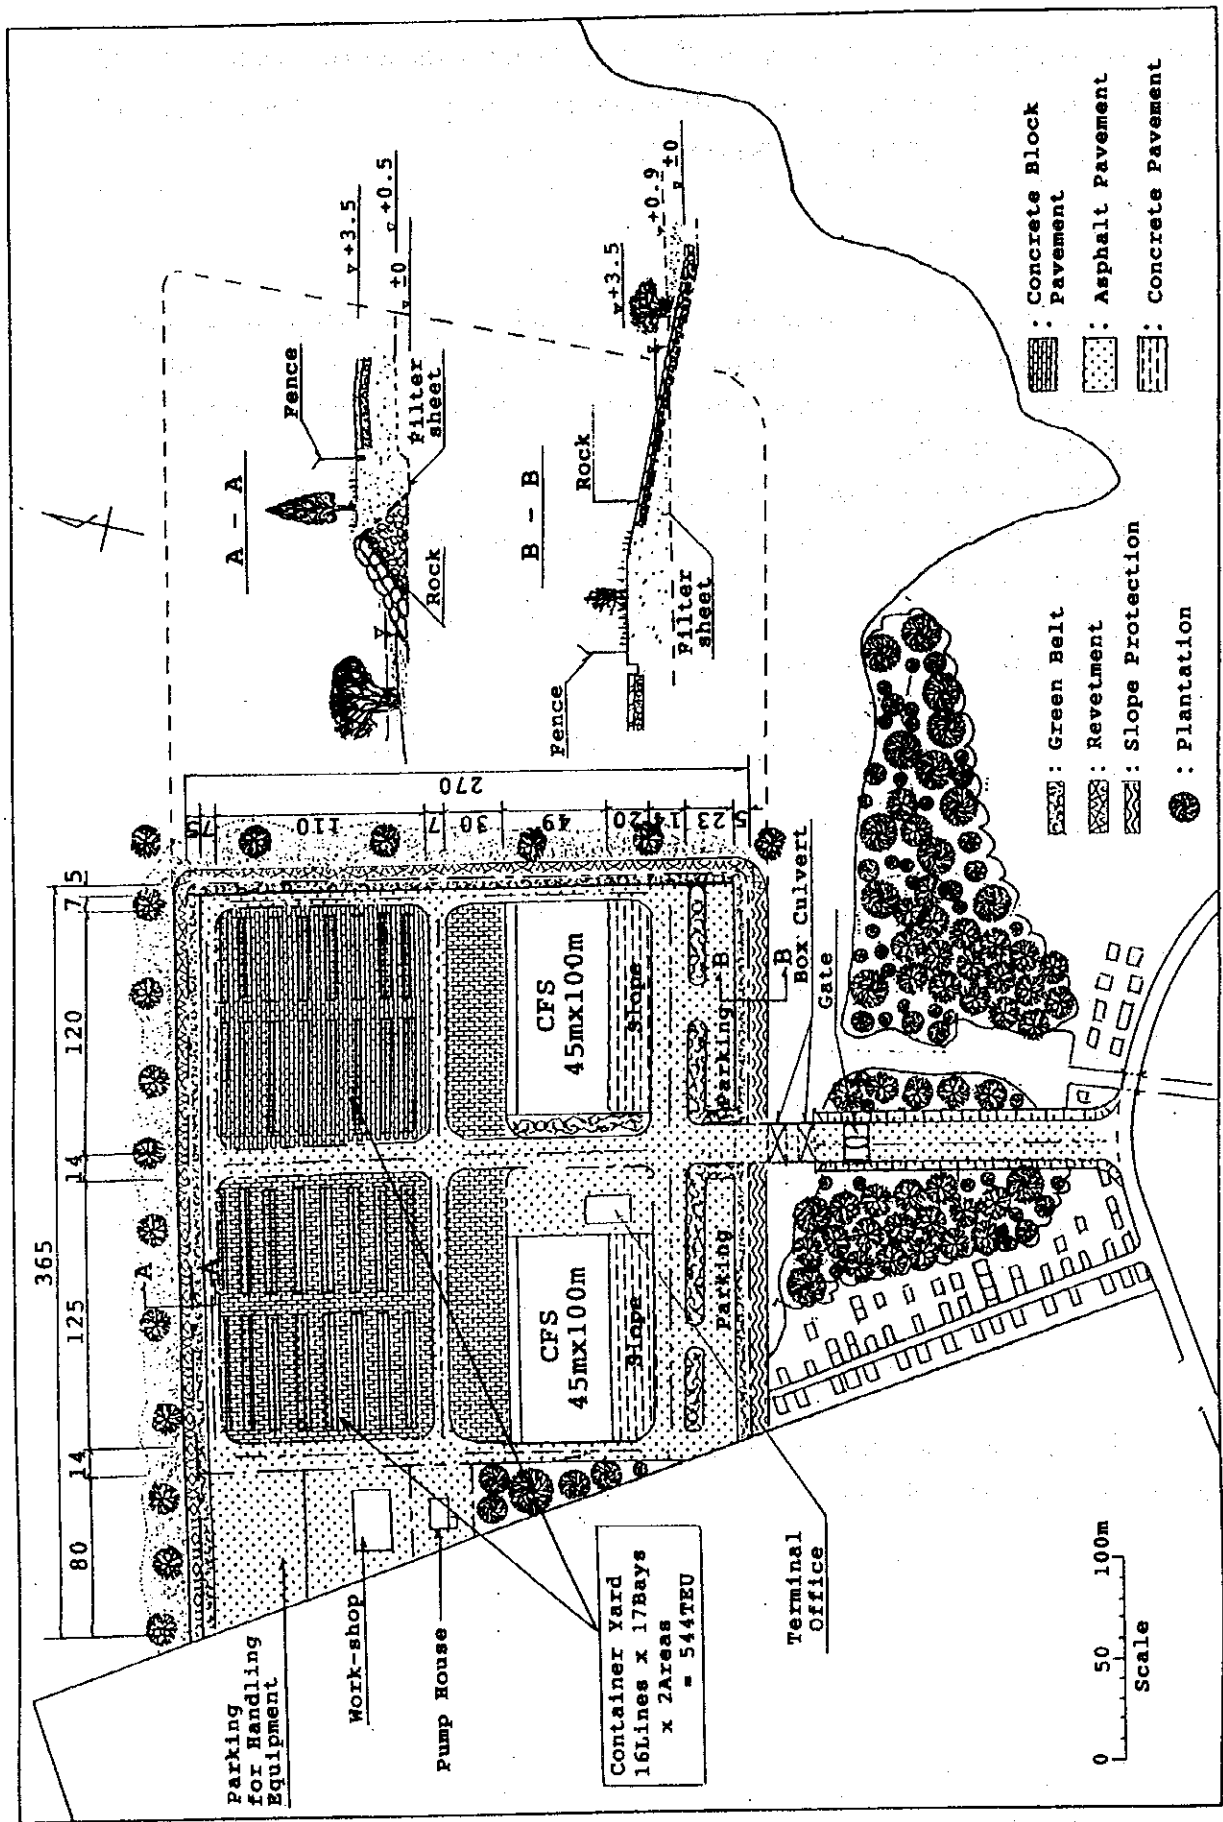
Layout Plan of Inland Container Terminal (2003)
